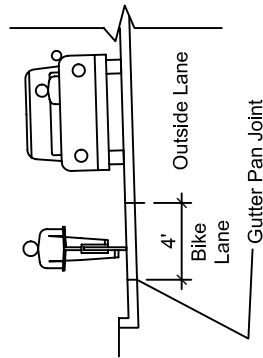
Bike lane on asphalt street with curb and gutter and no parking
